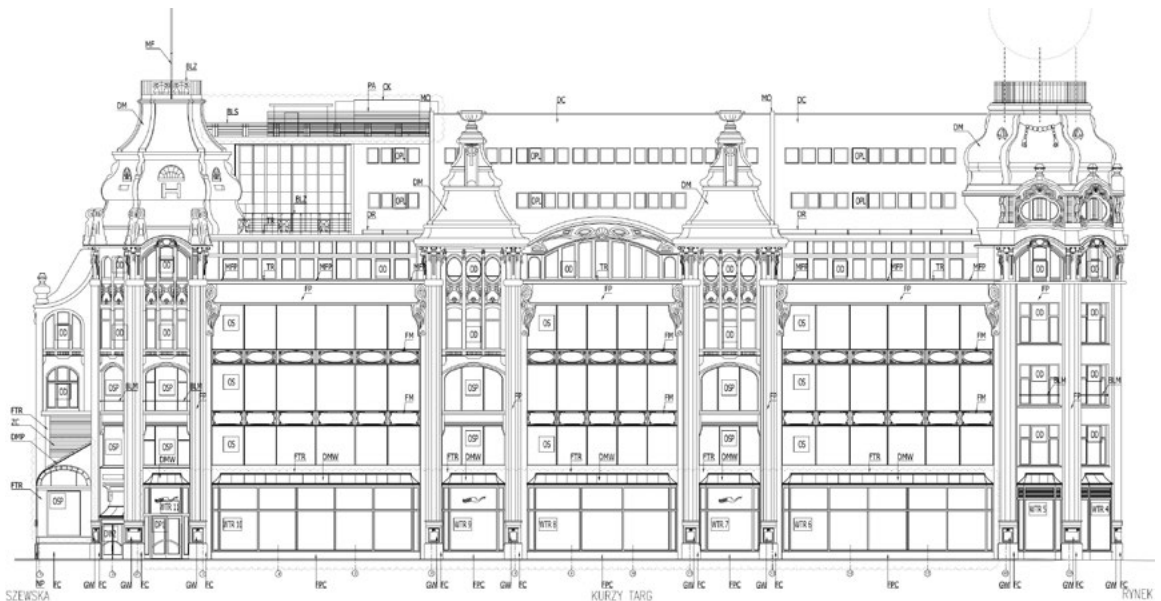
Feniks Department Store refurbished in several stages in 1997–2015 – west elevation drawing (by Kirschke Pracownia Projektowa).
